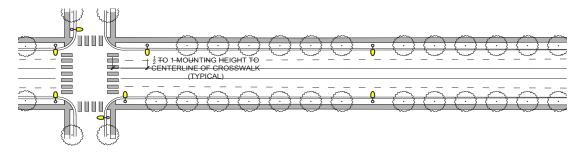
Typical Collector Street with Non-Continuous Street Lighting
